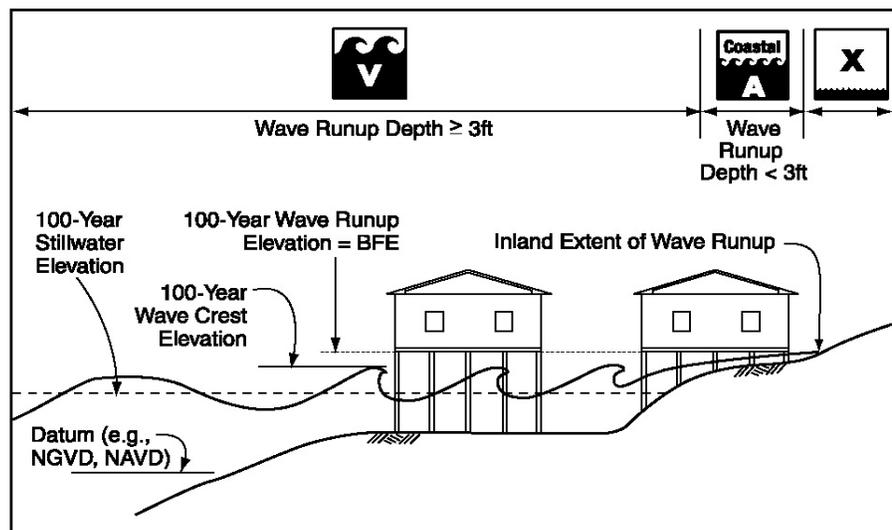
Where wave runup elevations exceed wave crest elevations, the BFE is equal to the runup elevation.
